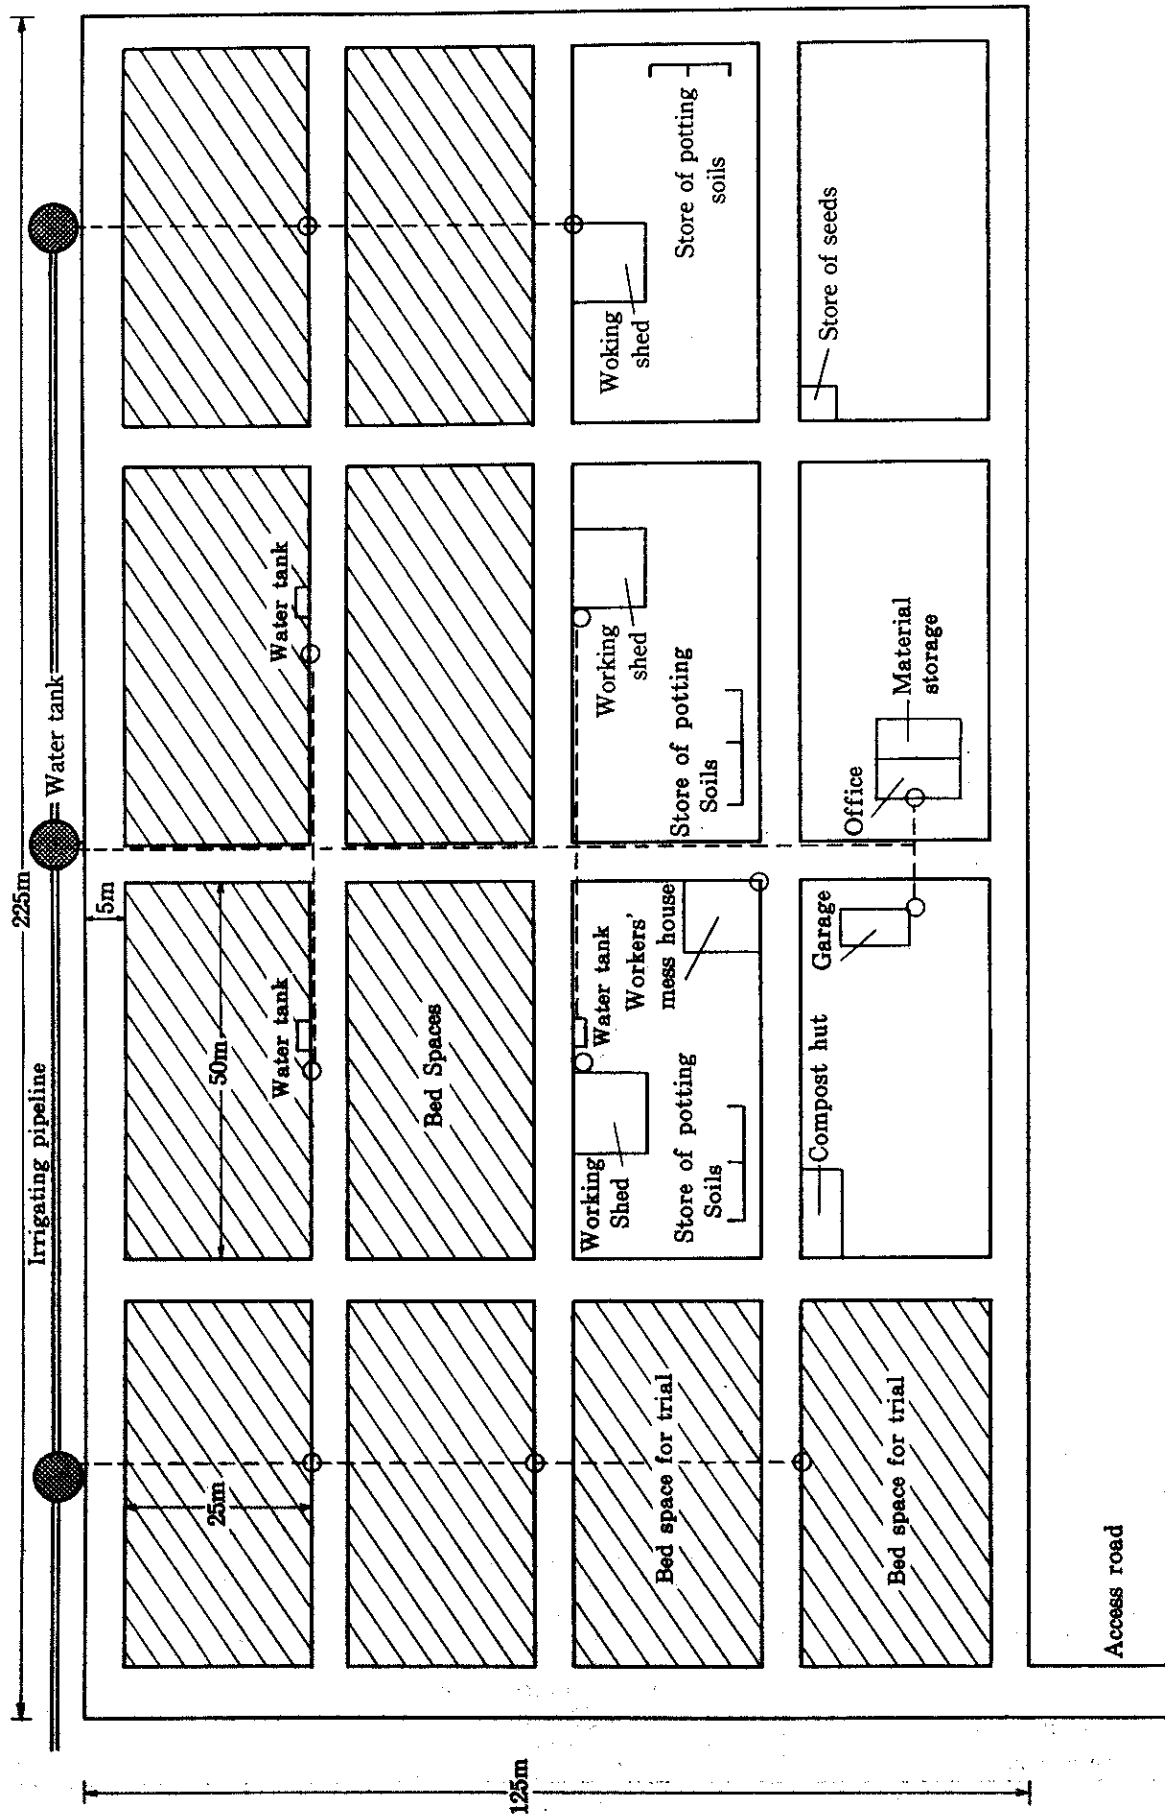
Layout of Same Nursery (1 : 1,000)
